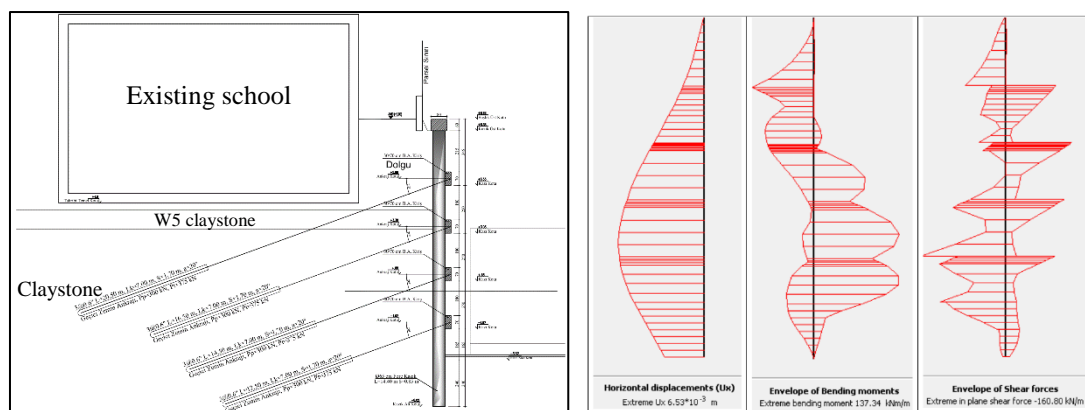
Details of shoring elements for the 4-4 sections (left) and acting forces on the section (right)
